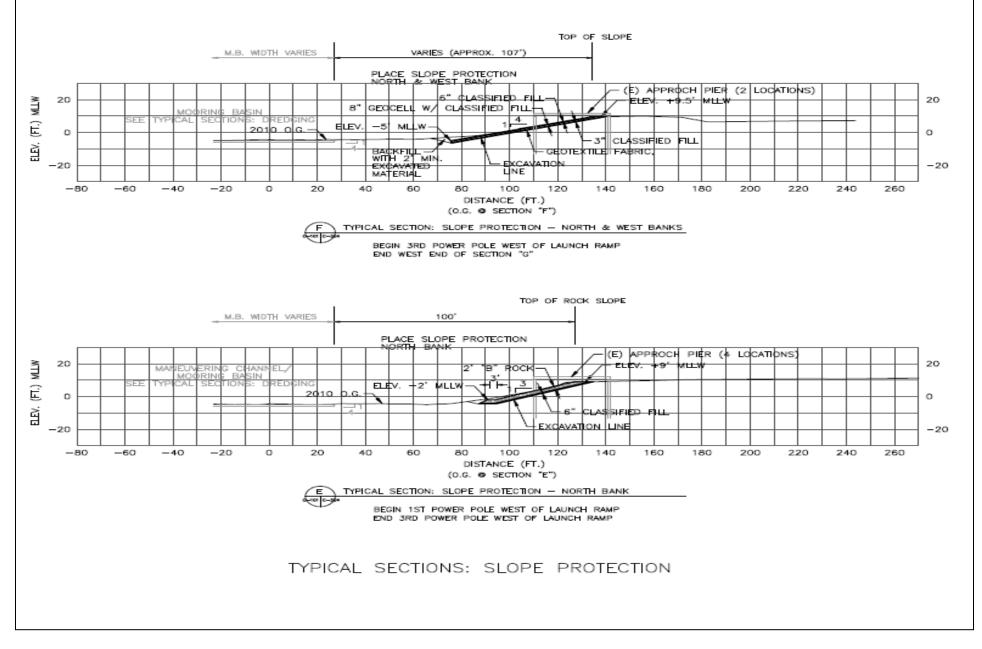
Slope protection profiles, north and west banks of Bethel harbor
